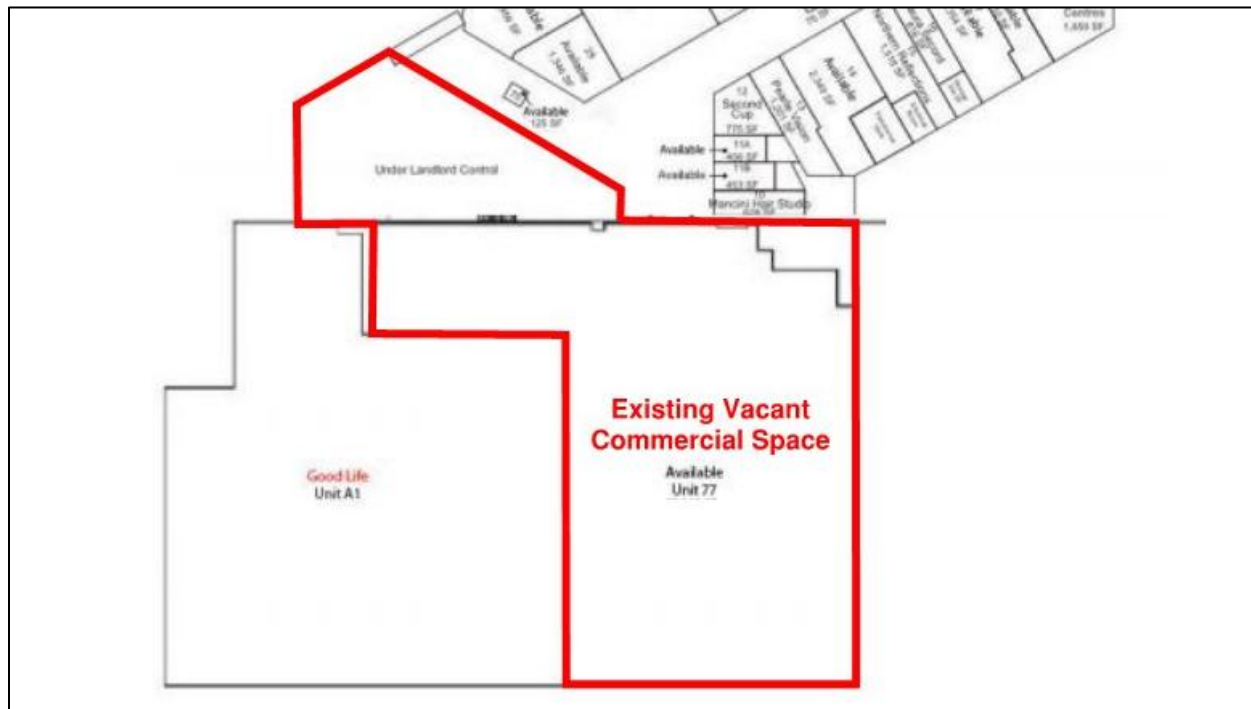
Excerpt of the Hazeldean Mall floor plan with the markup added by Novatech.
